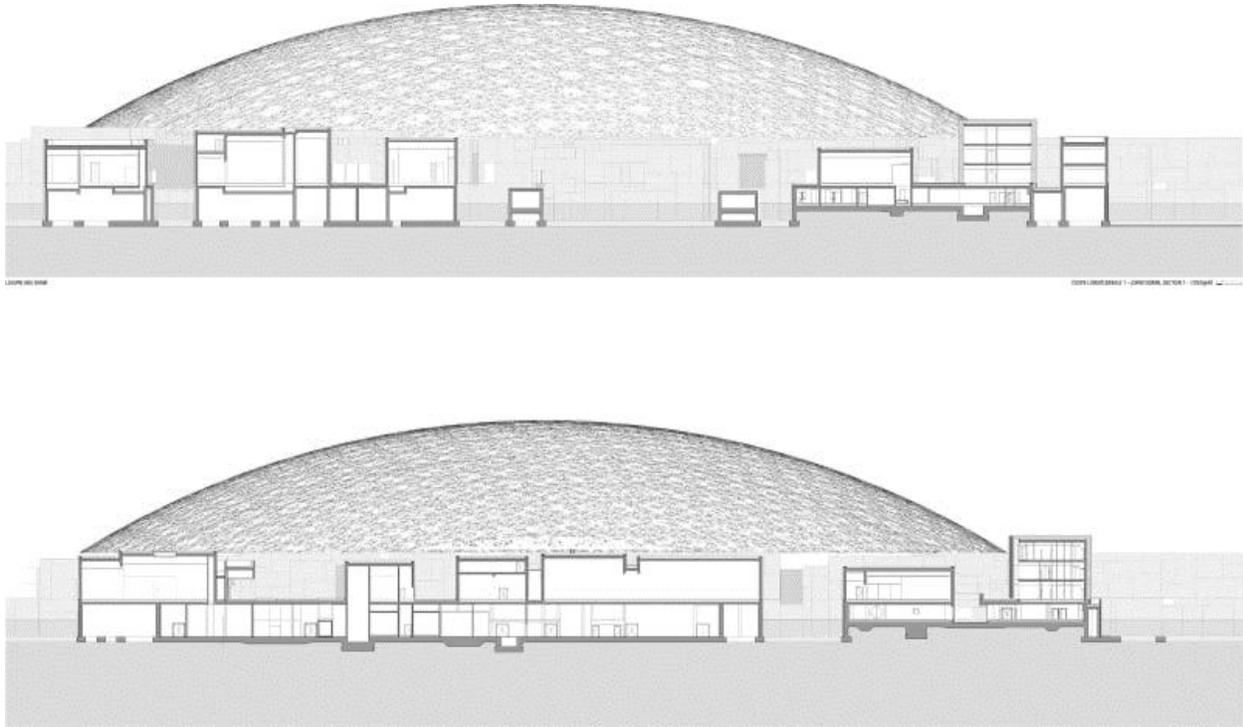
Dome Roofing Design of Louvre Abu Dhabi
